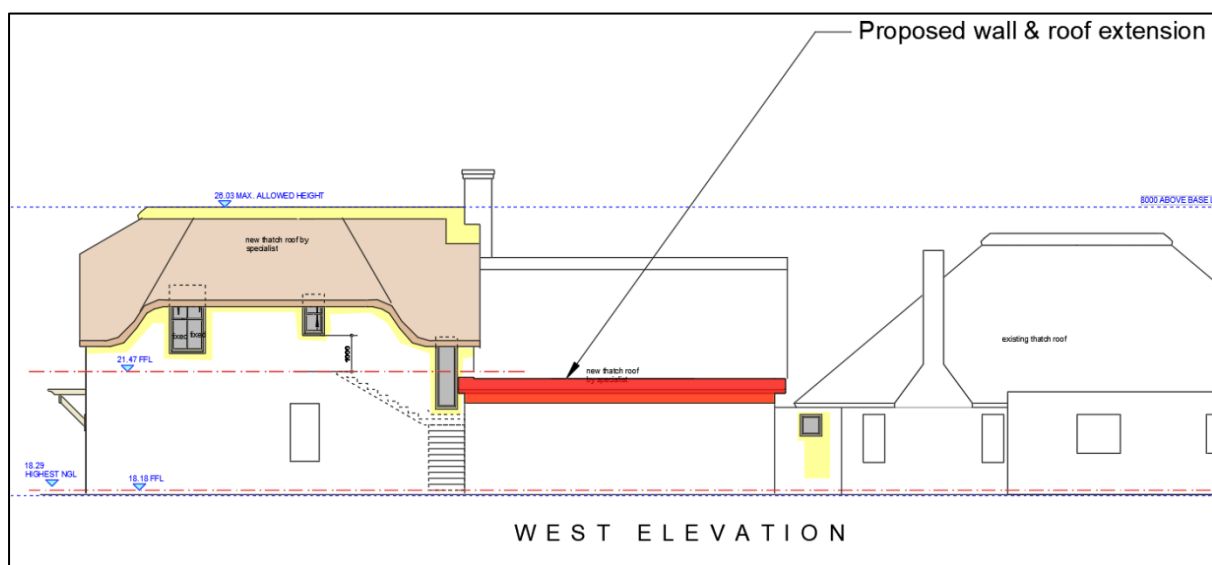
Encroachment of the proposed height extension of the existing exterior wall and roof
